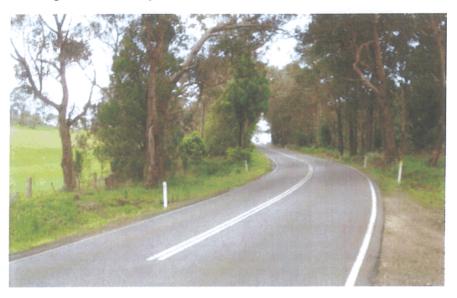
Walhalla-Tyers Road, looking north from proposed access point
